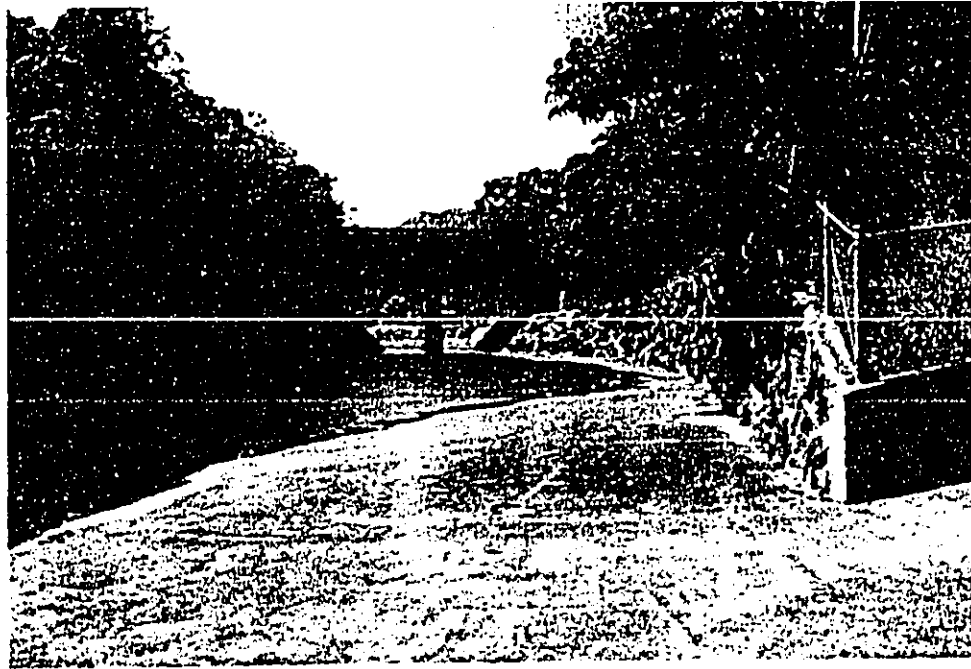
View showing Kāneʻohe Stream and Retaining Wall Looking West towards Kamehameha Highway
